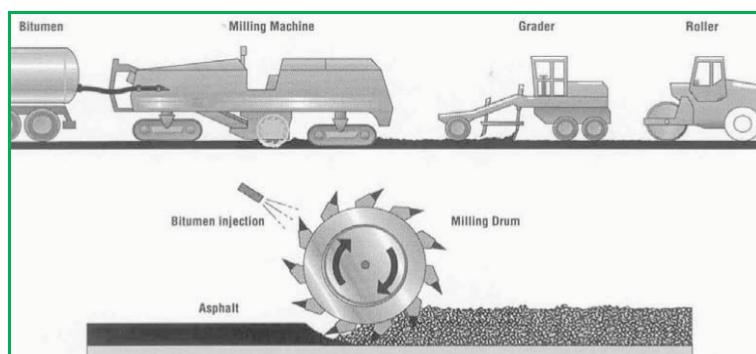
Asphalt recycling travel plant [EAPA, 2005]
